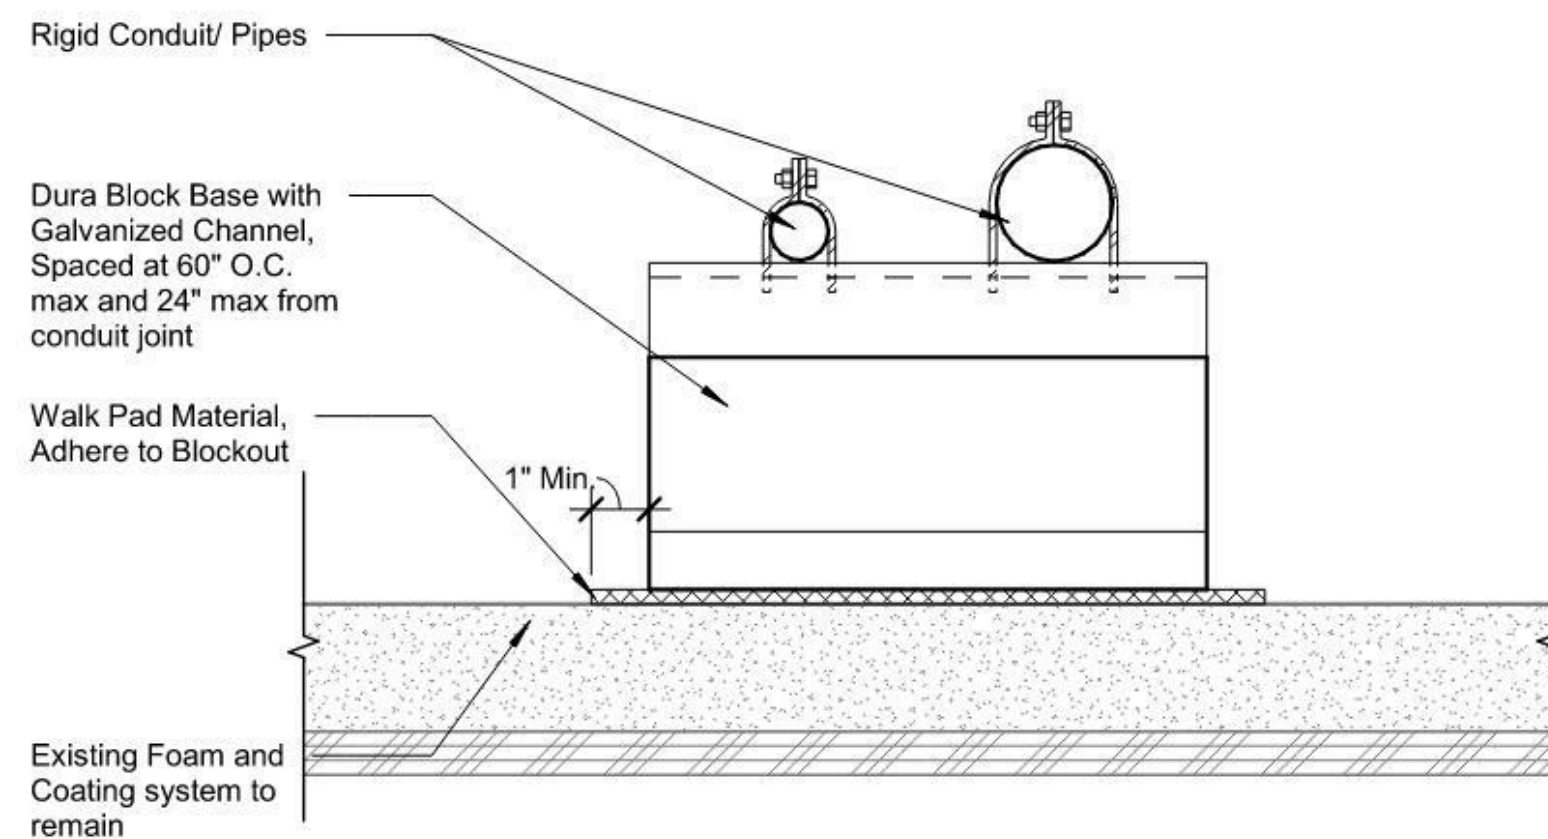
DETAIL IS FOR WATERPROOFING ONLY. FOR PLATFORM CONSTRUCTION AND EQUIPMENT ANCHORAGE REFER TO 1/M4.1.
